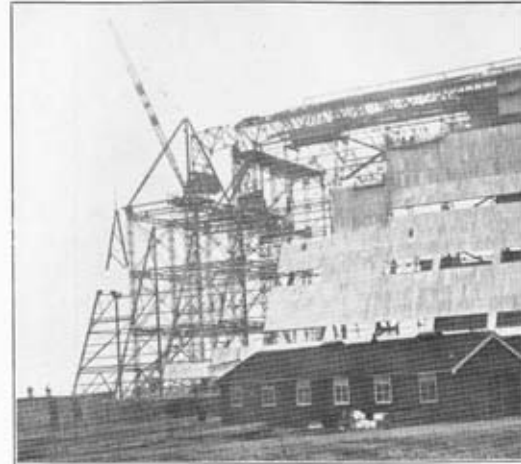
Shed, showing new "A" Frames to extension in course of erection.
